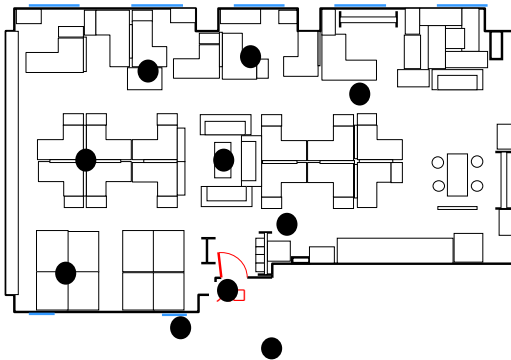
The experimental floor plan with 7 BLE locations inside and 3 BLE locations outside.
